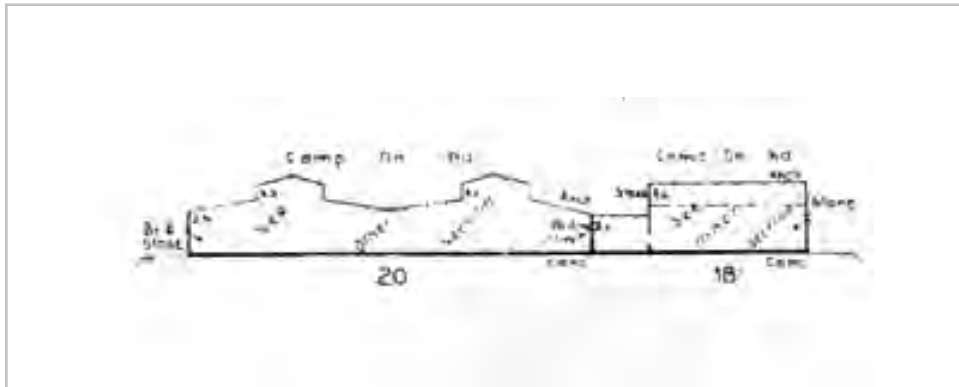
Factory Mutual Insurance Co. *Mill Realty Co.* 1965. Southeast-northwest cross-section through Buildings 20 and 18. Scale: 1 inch= 30 feet (approximately).
